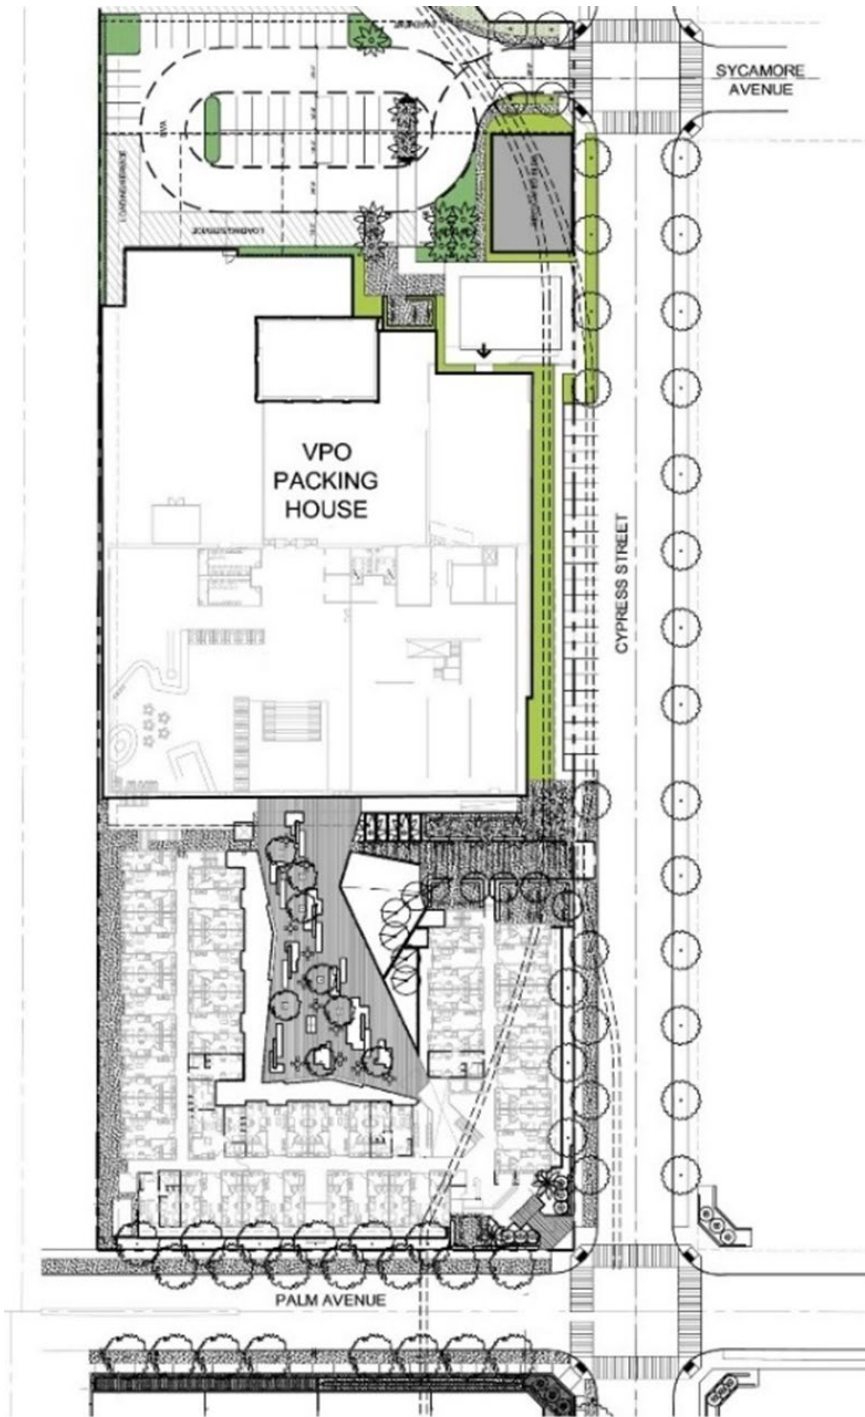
Site plan, north half; Source: Bennitt Design Group, 2016
